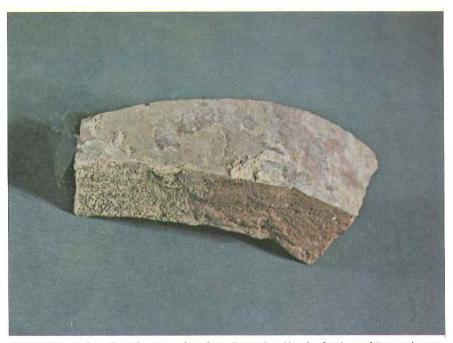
Broken clay tile pipe taken from Excavation No. 8, showing calcium carbonate deposit on face of old fracture.
